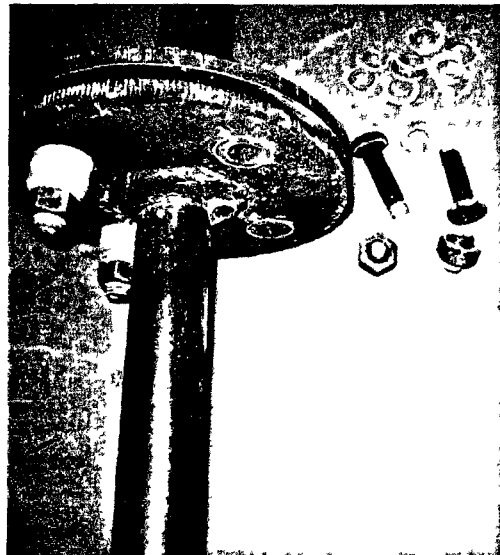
Test Specimen # 6 after Failure Showing Fracture of Bolts
